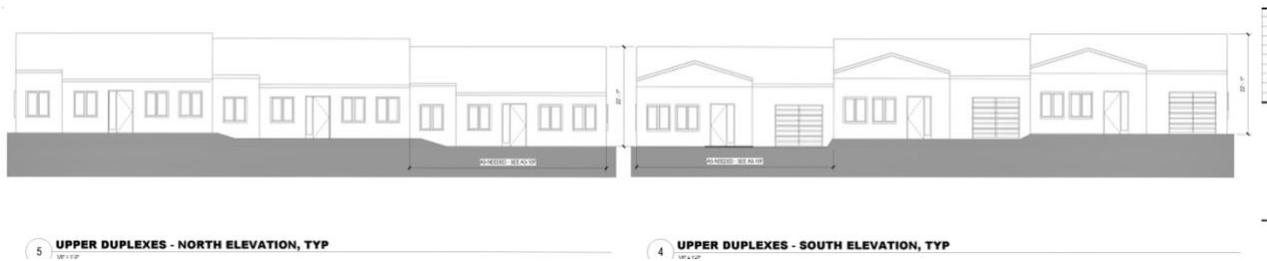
Elevations of proposed upper duplexes, taken from Sheet A-10F of the Carmel Valley Master Plan design submittal.
